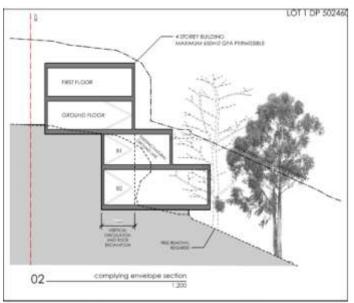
Compliant Height Envelope Section (Source: Noho Architecture)
